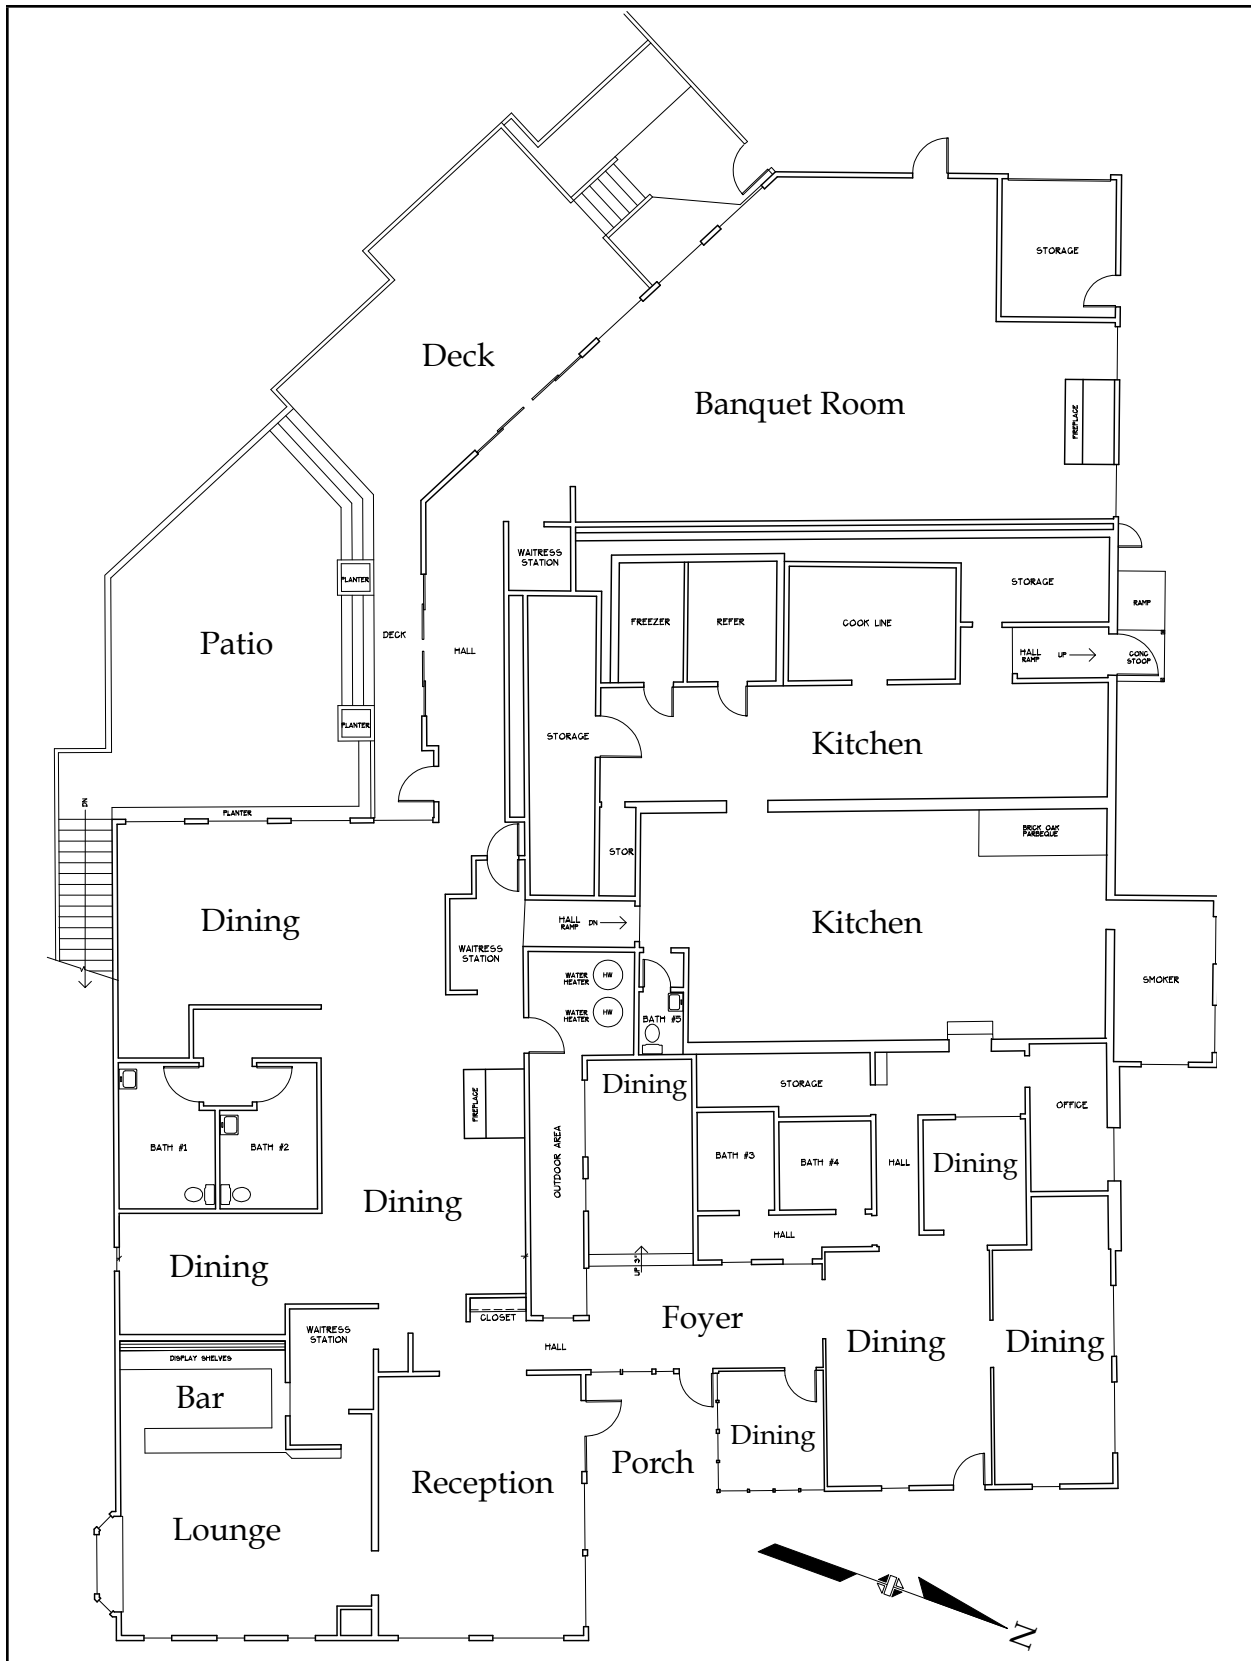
Existing Floor Plan of the Brambles Restaurant August 2012
